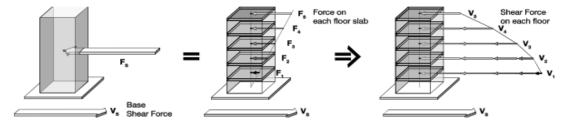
Lateral forces and shear forces generated in buildings due to ground motion
